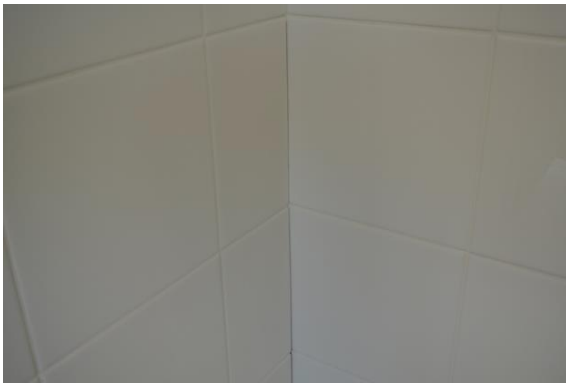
GAP BETWEEN TILES AT WALLS CORNERS
